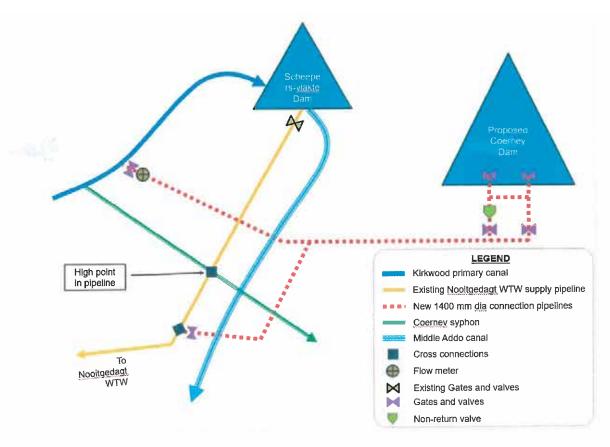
Schematic Layout of Coerney Dam and Connecting Pipelines
